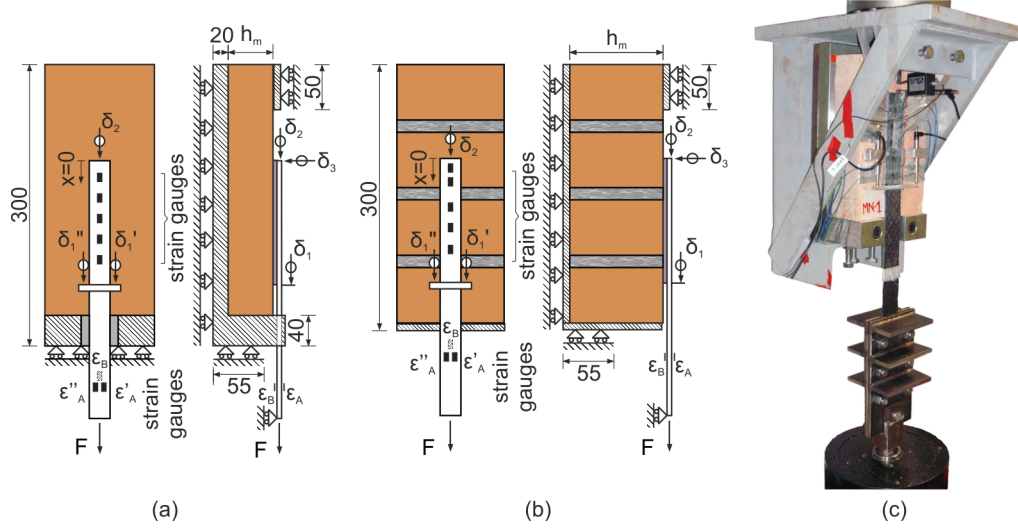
Static schemes and test setup with the applied instrumentation: (a) brick specimen; (b) masonry block specimen; (c) picture of a specimen mounted into the steel cage.
